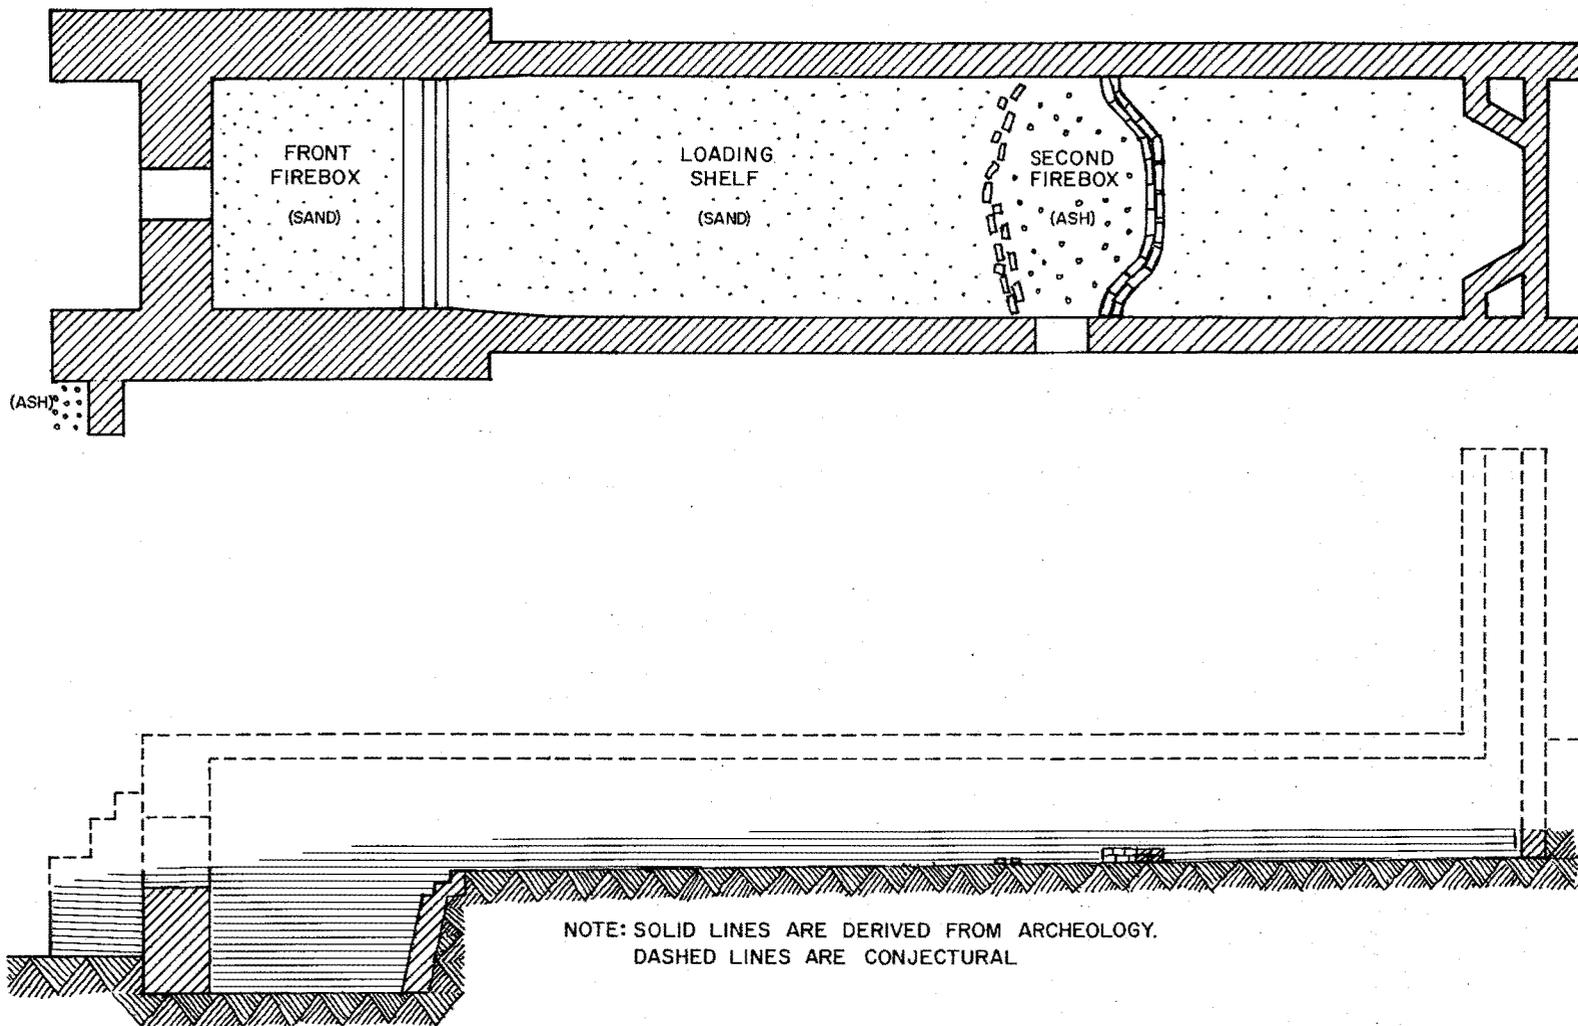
Top: Plan of the Kirbee Kiln. Bottom: section of Kirbee Kiln from information obtained from excavations done by the Texas Historical Commission, 1973-1974.
